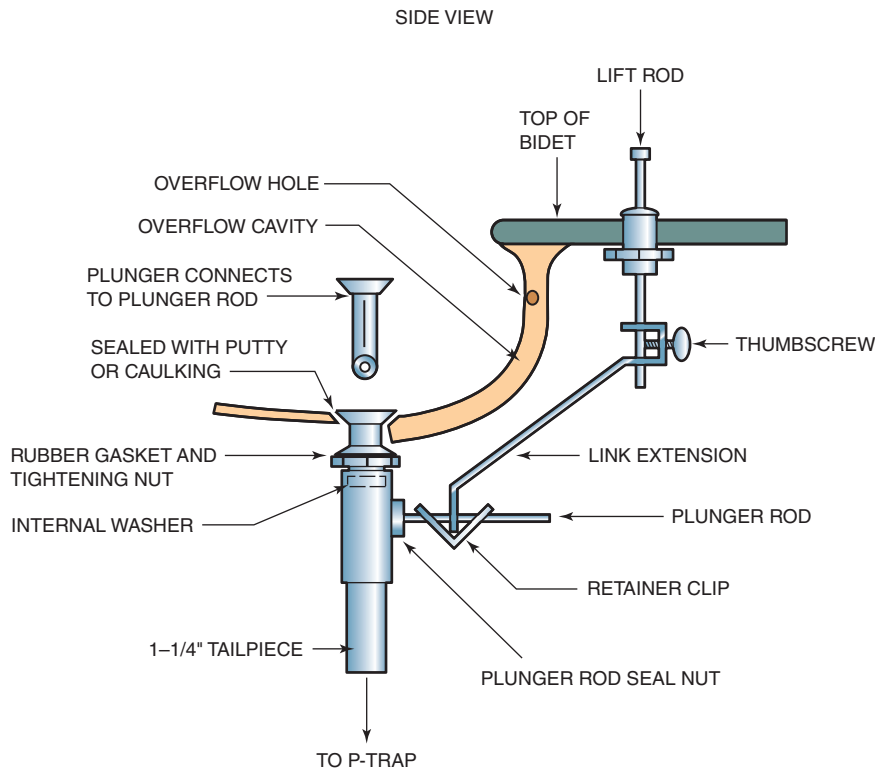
A bidet drain assembly is similar to a lavatory pop-up assembly and uses a linkage assembly to operate the drain from above the fixture.
